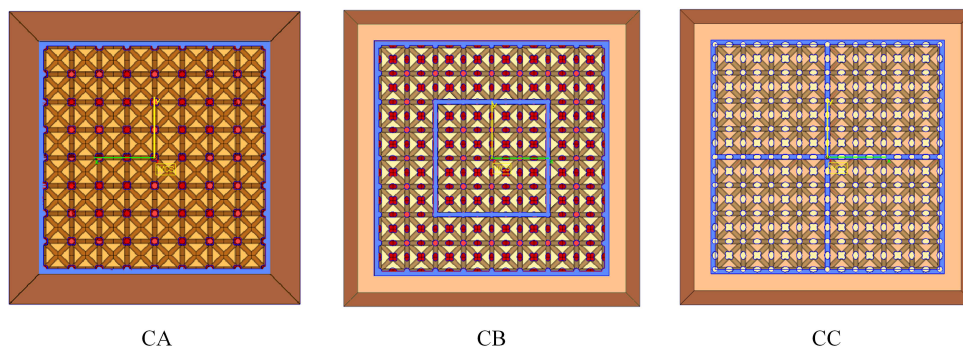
Specimens cross section: arrangement of the dust containment walls
